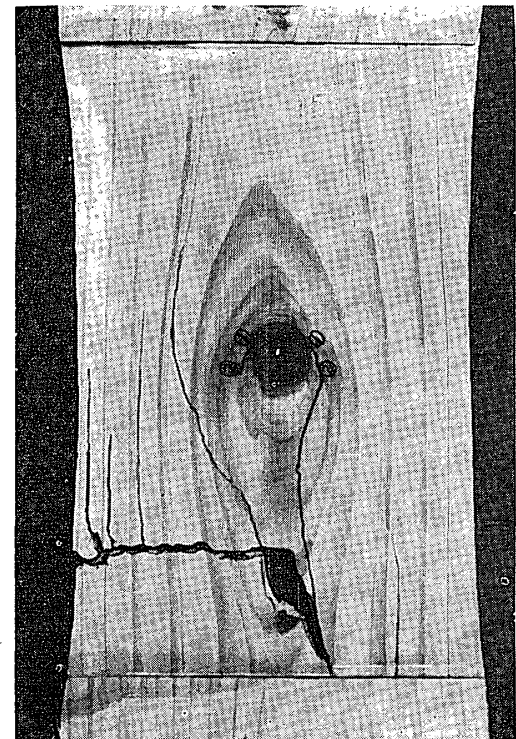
Pith side face of knotty specimen after failure test (Specimen No. 15).
